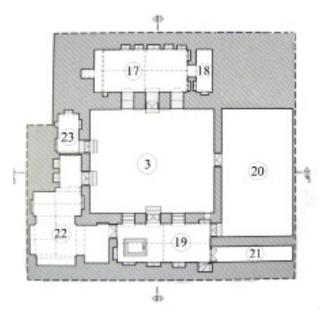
Basement Floor Plan of Akhavizadegan Khaneh-Hussainia (Mohamadzadeh et al., 2007)
